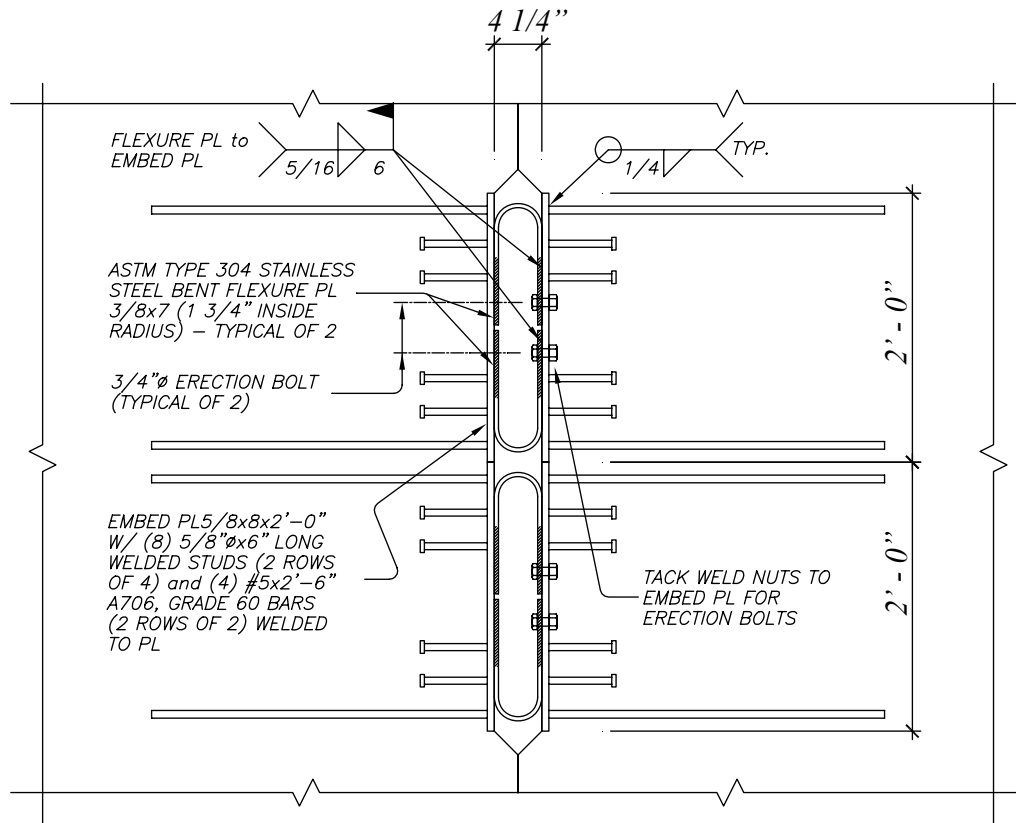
Connection details of UFP connectors in the PRESSS building [1.18]
